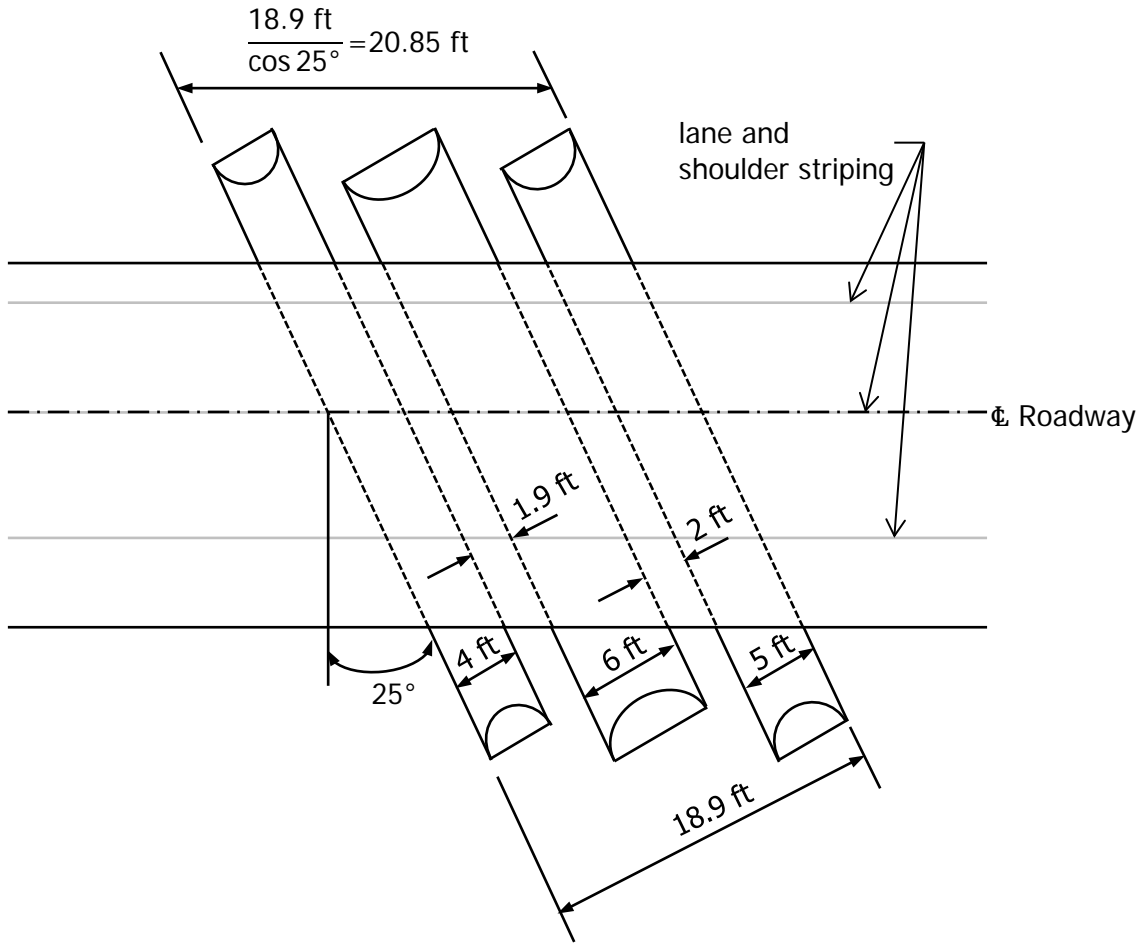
Plan view of a skewed, multi-pipe culvert under fill.
